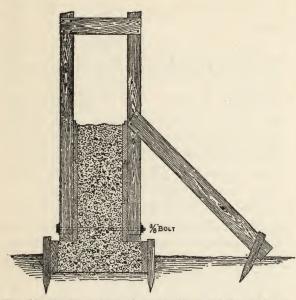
Simple method of constructing the forms for a foundation wall. Note the footing and the method of bracing the forms to prevent bulging.
